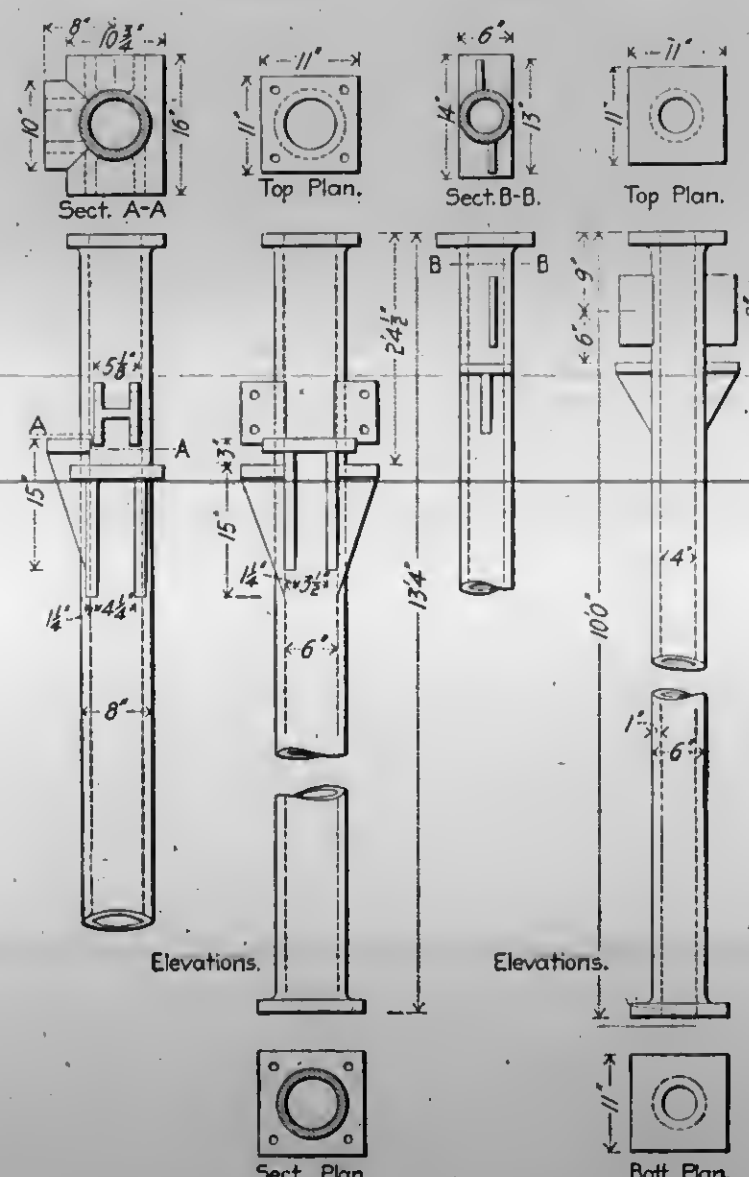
DETAILS OF THE 6 IN. AND 8 IN. COLUMNS.
